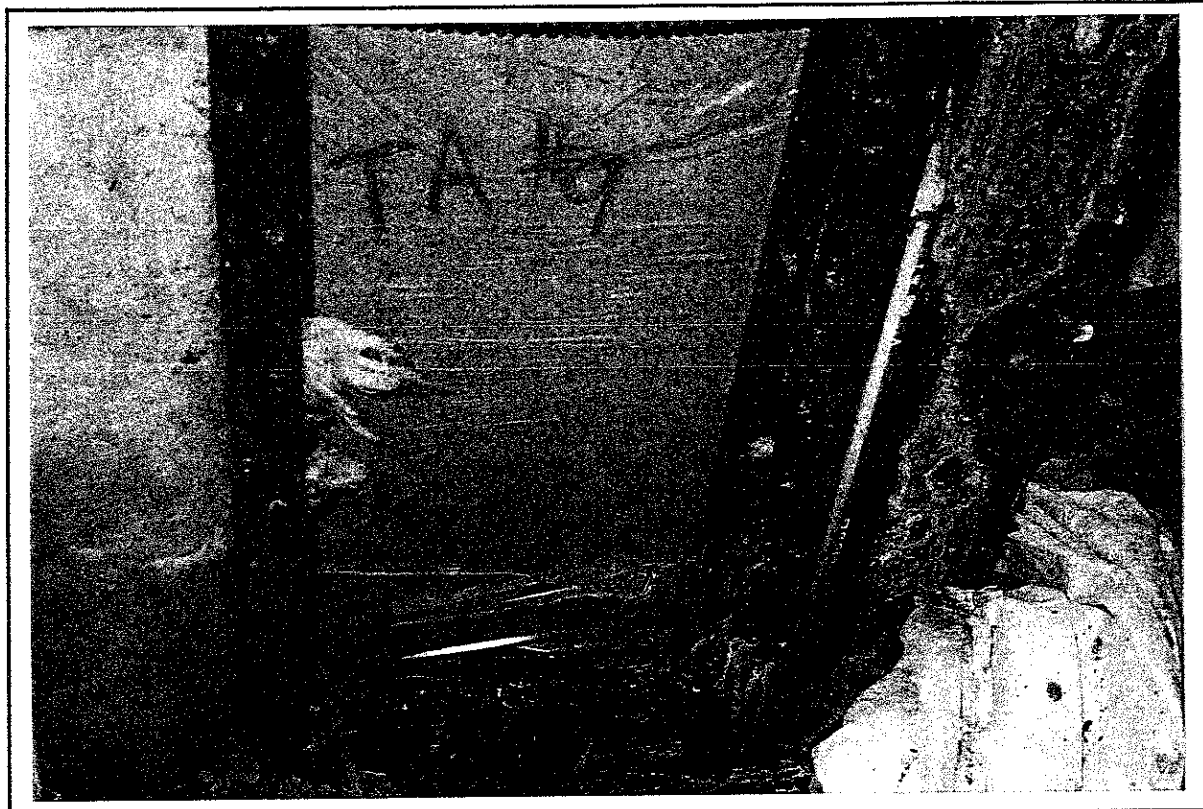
Test Area #9 – Close-up of corroded steel studs and bottom plate
